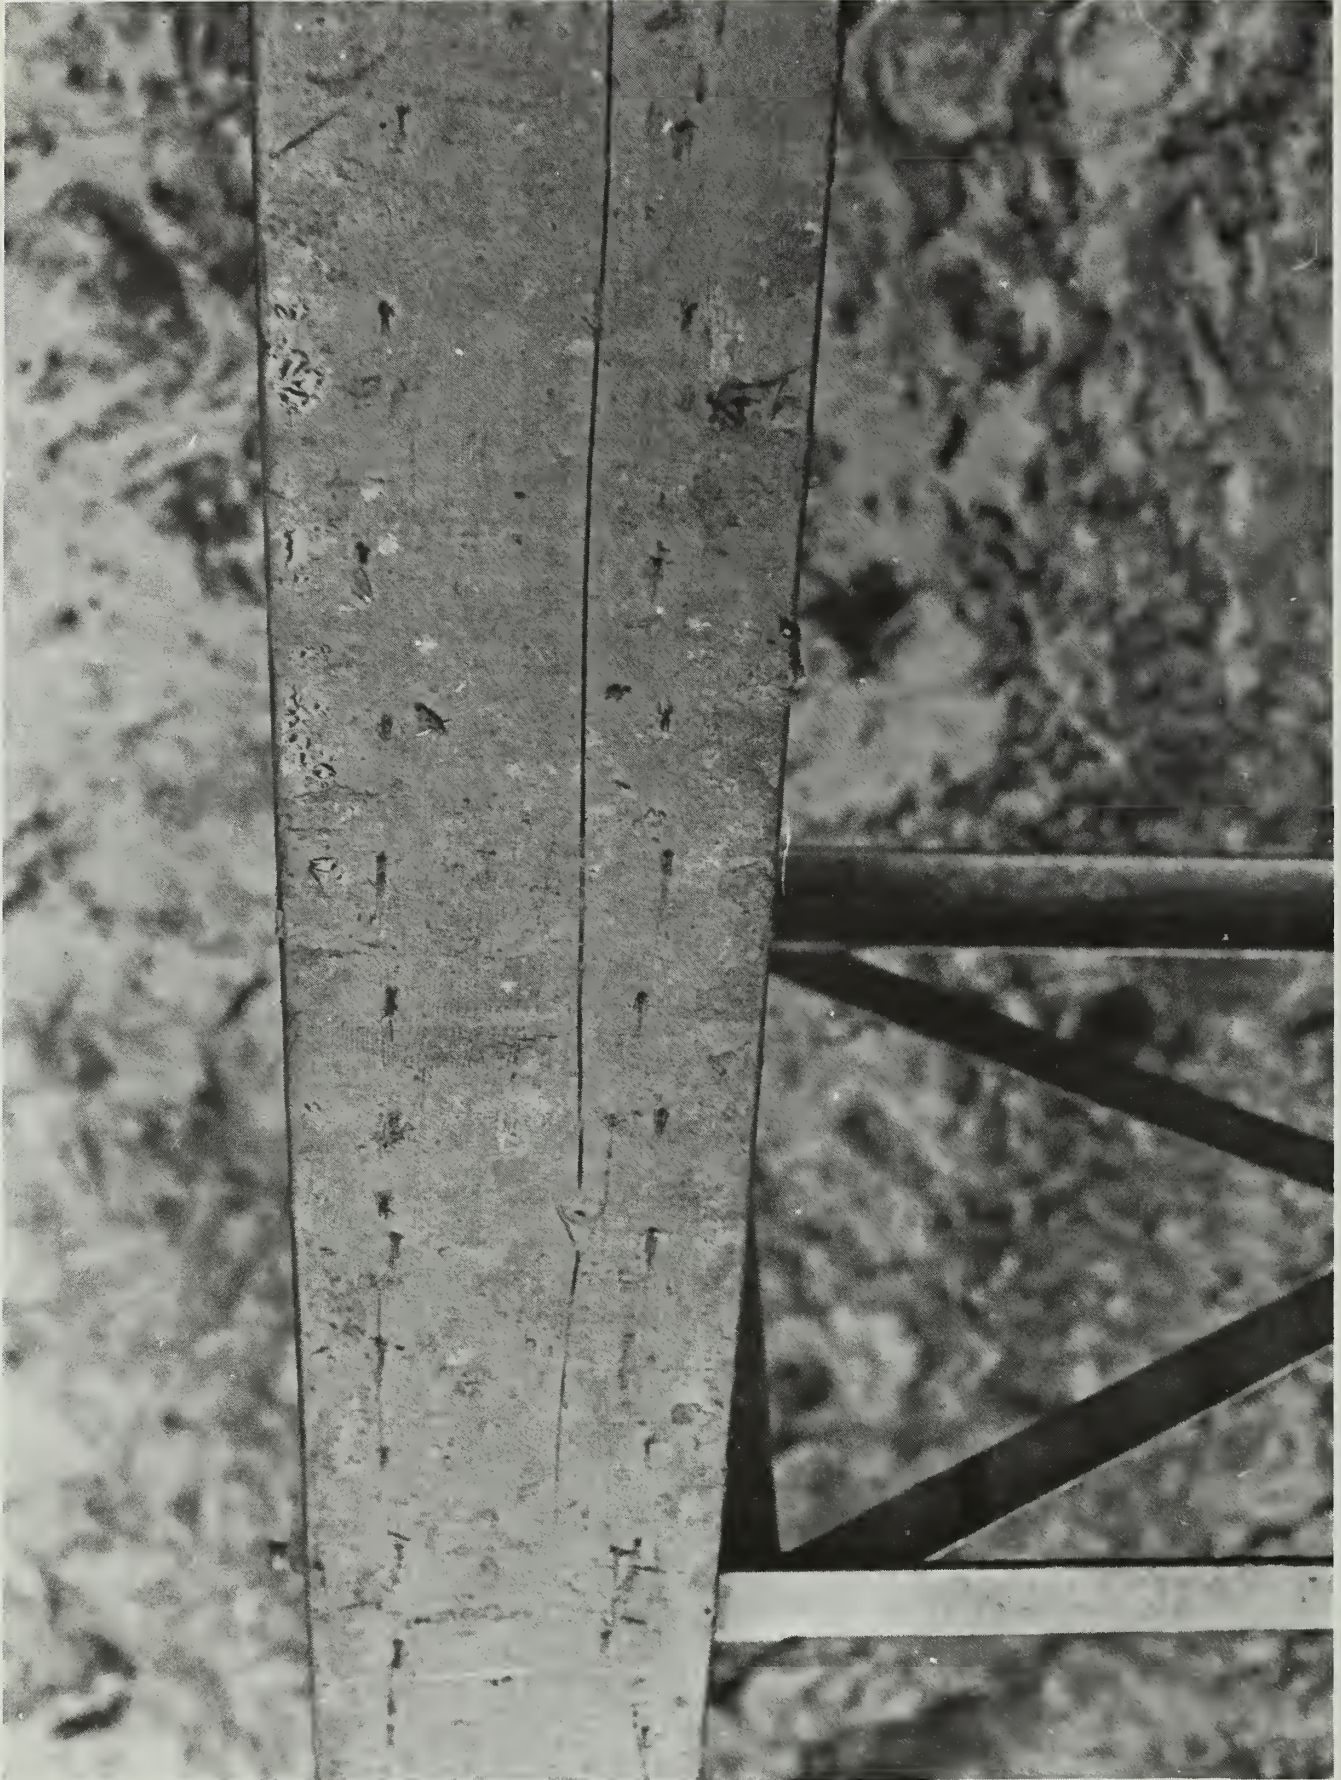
A section of the upper surface of an outer stringer showing the toenail holes and a large seasoning check. Both the toenail holes and the large checks expose untreated wood to rain seepage and consequent moisture buildup that constitutes a significant decay hazard.
